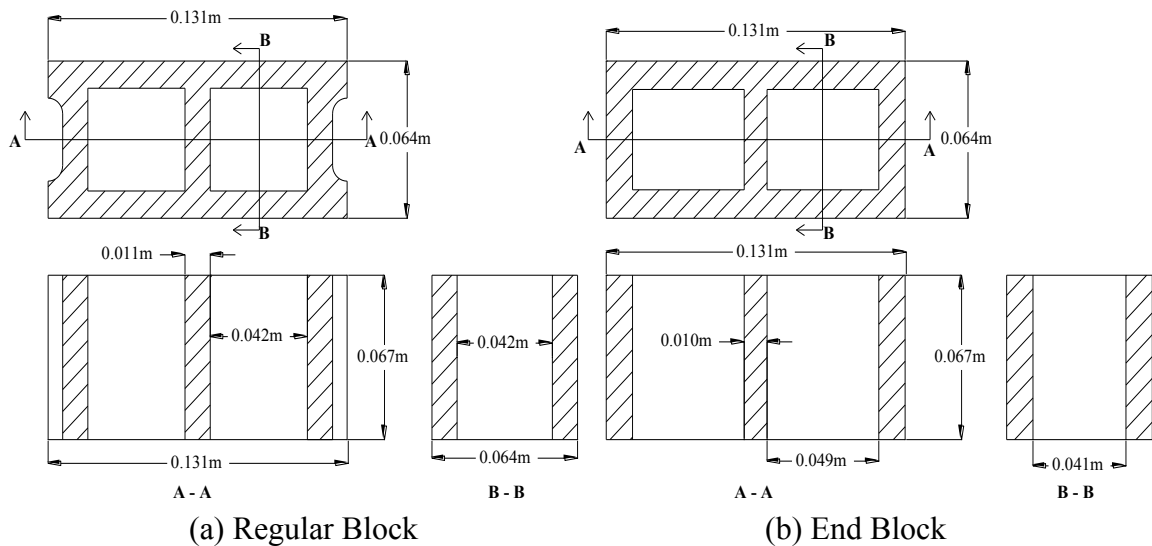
Typical regular and end concrete masonry unit blocks dimensions.
